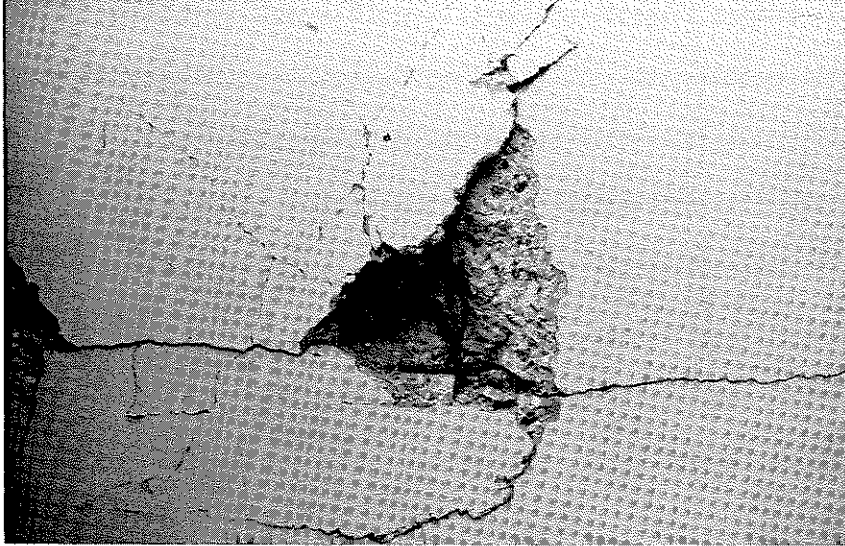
Most of the interior concrete walls in the first, second, and third stories of Holy Cross Hospital were cracked. At some points, where concrete spalled, the reinforcing steel was visible.
